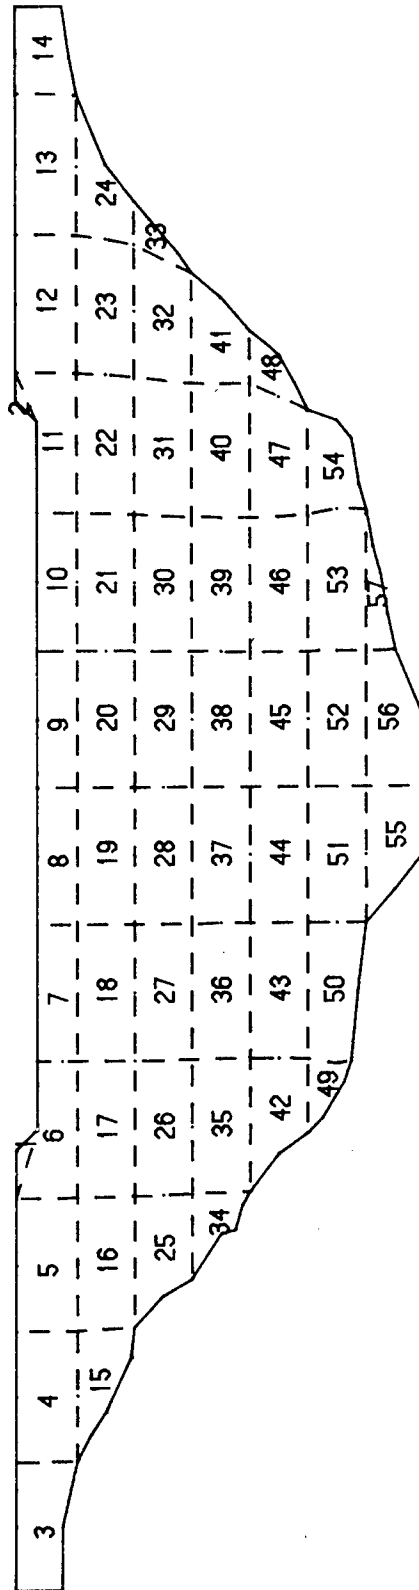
DEVELOPED VIEW OF DOWNSTREAM FACE, LOOKING UPSTREAM
